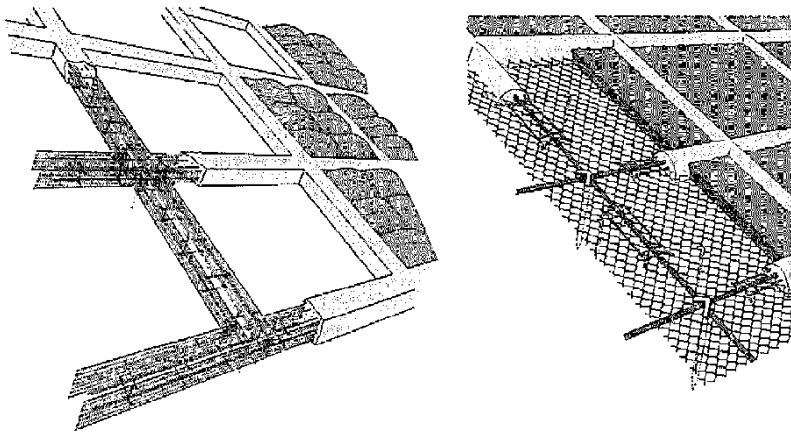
WORKING EXAMPLE OF GRATING CRIB WORKS USING PRECAST BLOCKS
